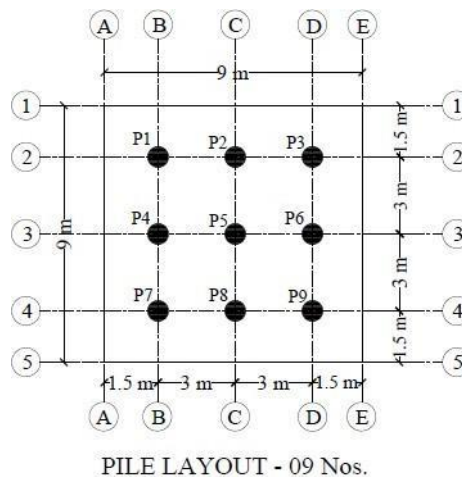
Plan of pile layout with sections 1-1 to 5-5 and A-A to E-E
